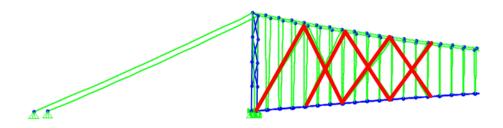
Vertical Bracing Pattern at Ends of 70 m Span Footbridge
